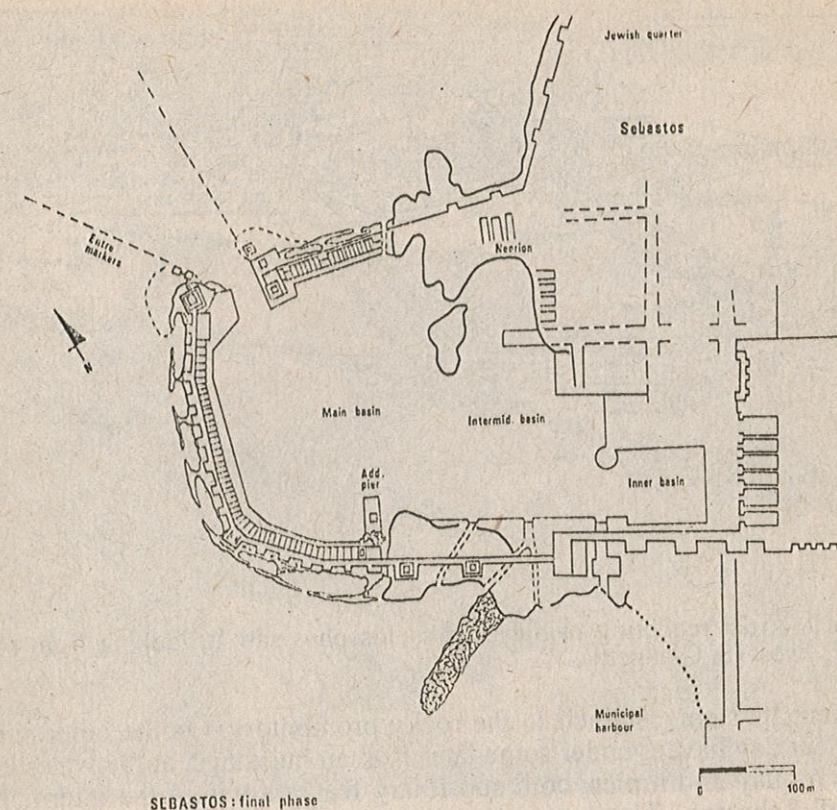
Schematic rendering plan of Sebastos at its final phase of construction (A. Raban).
